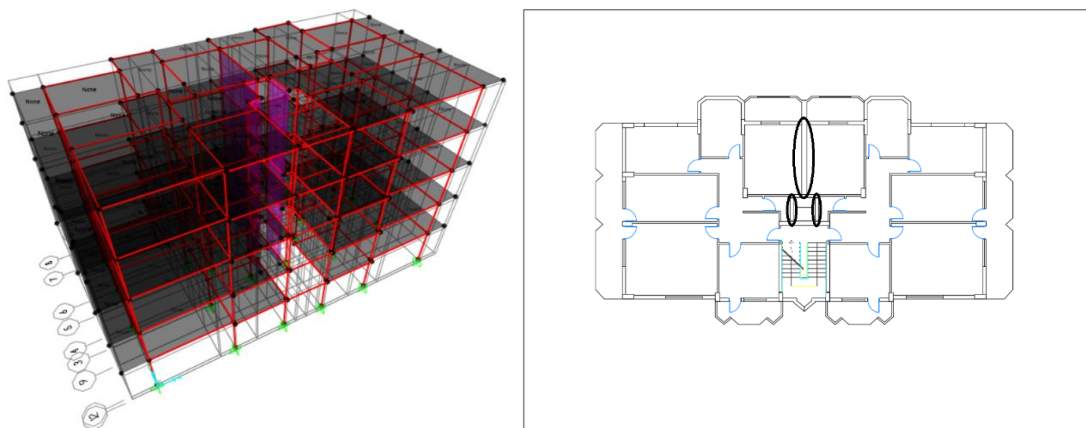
First shear wall configuration used for strengthening (shear wall-I).
